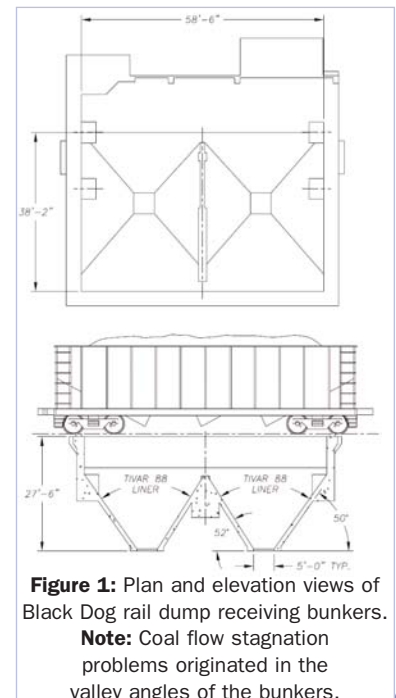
Plan and elevation views of Black Dog rail dump receiving bunkers.
